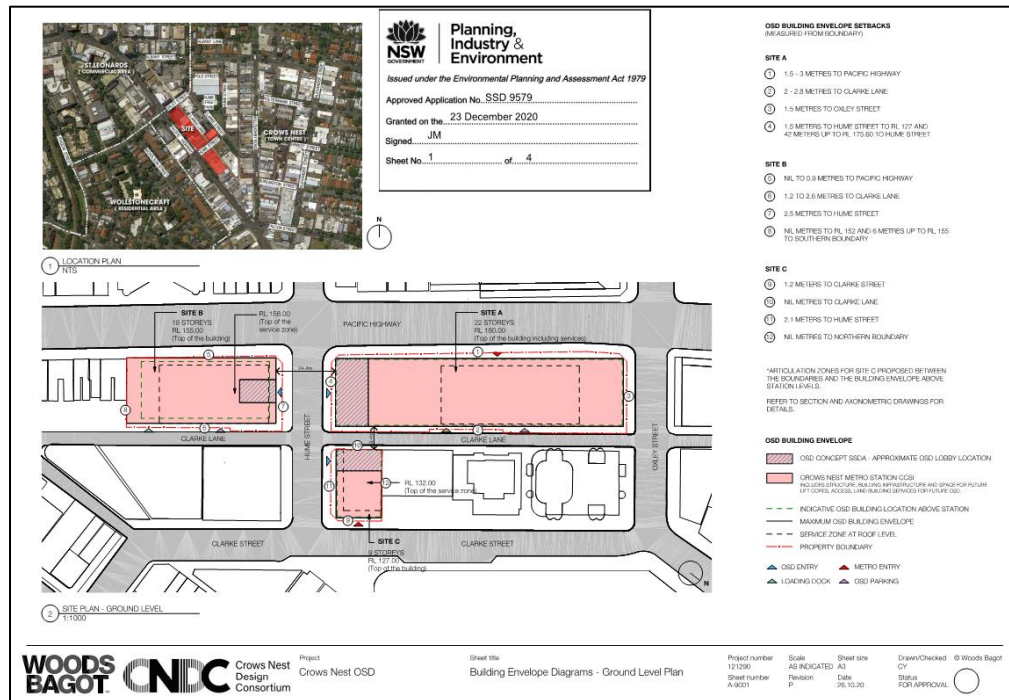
Approved Building Envelope Diagrams (Source: Woods Bagot)
